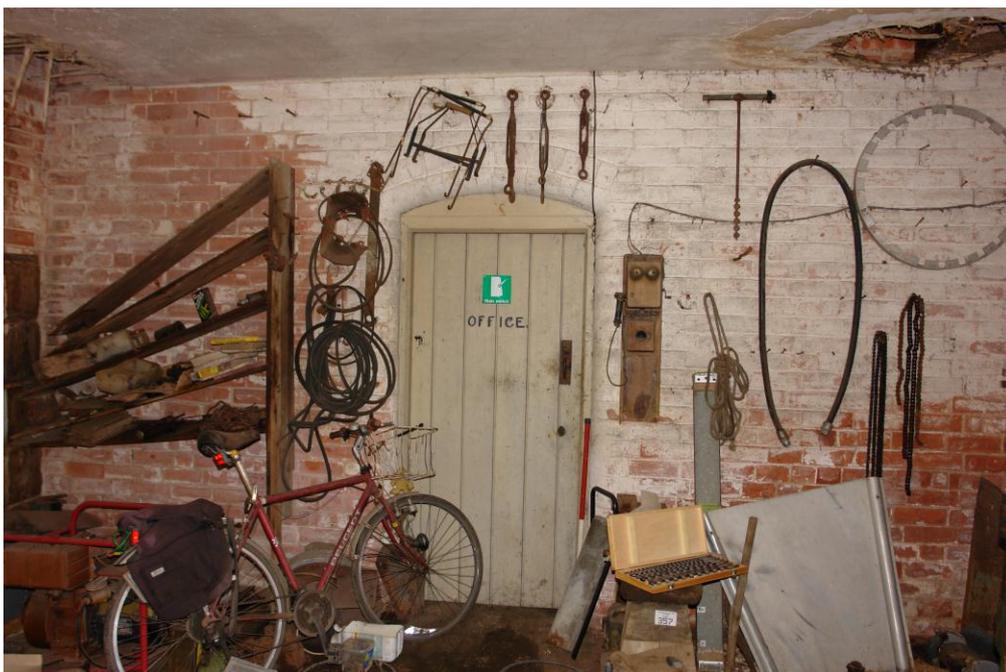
Building 5 - Internal view looking W showing plank-and-batten door set within a segmental-arched opening, leading to the panelled office
